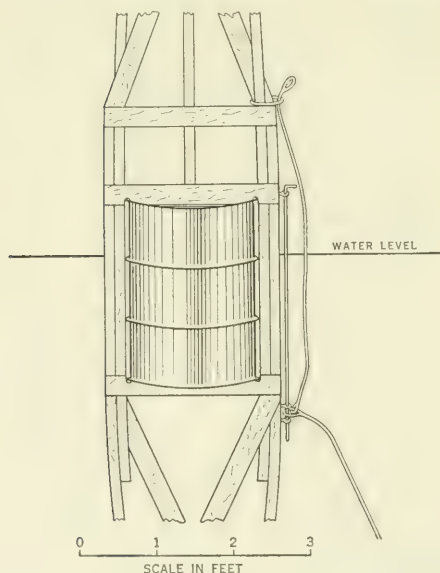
Arrangement for a detachable buoy anchor cable.
